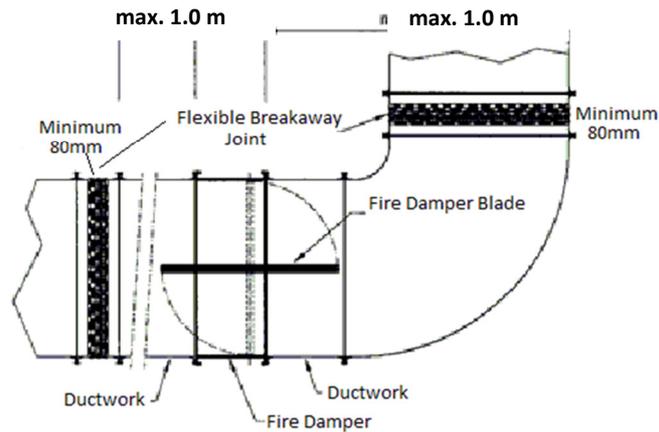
Example of an arrangement with flexible breakaway joints and connecting bend
